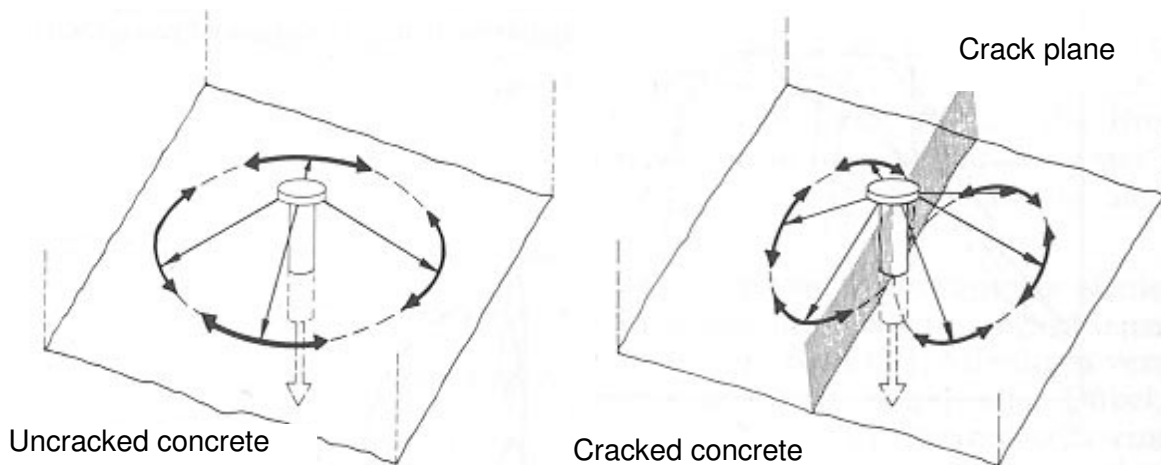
Hoop stresses around anchor in uncracked and cracked concrete (Eligehausen et al, 2006)
